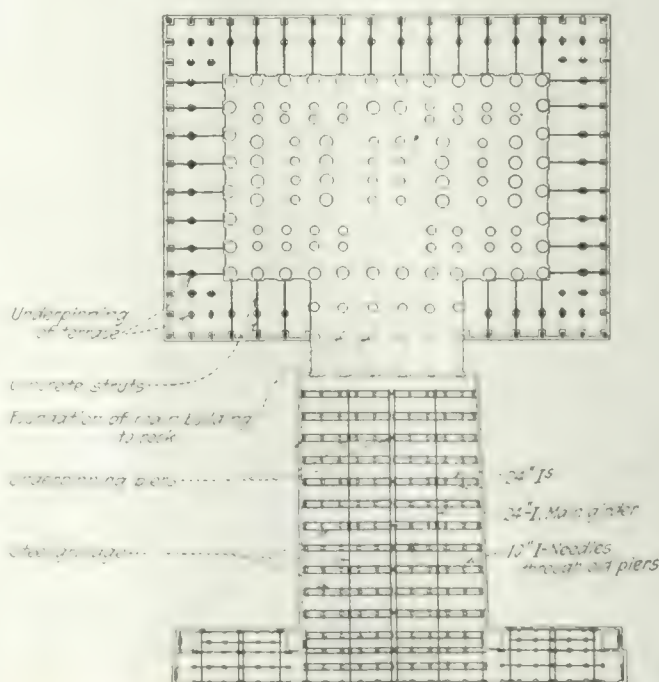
DIRECT UNDERPINNING OF TERRACE COLUMNS AND STEEL GRILLAGE SUPPORT OF APPROACHES
